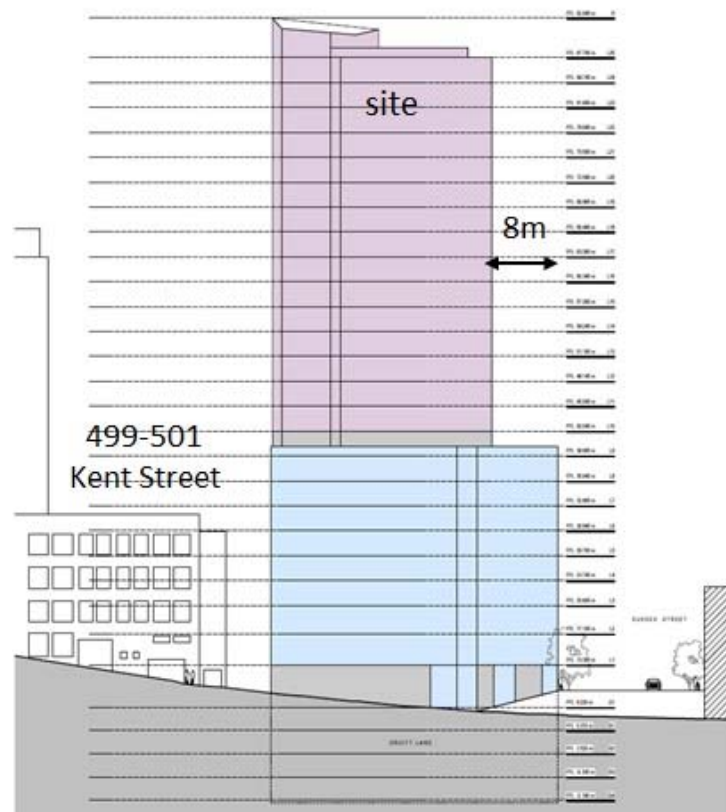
Northern (Druitt Lane) elevation of Stage 1 concept approval showing 8m approved setback above street wall height to Sussex Street.
